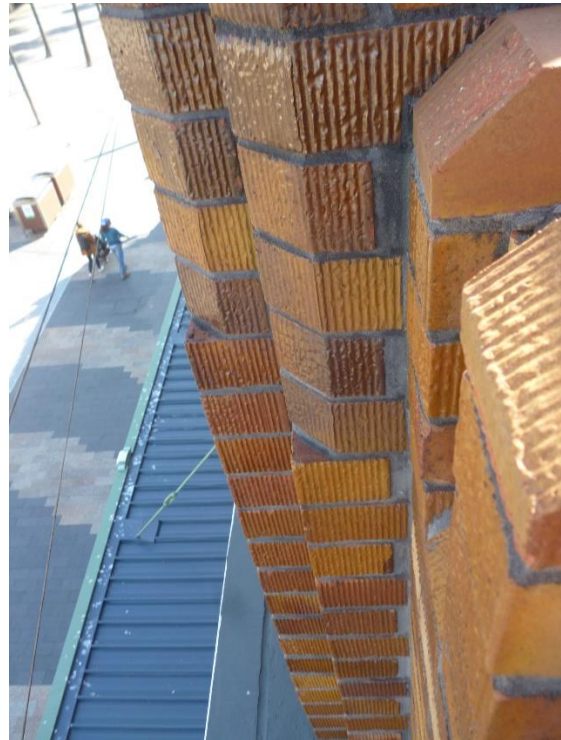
View of the brick detailing on the exterior of the Hotel Steyne.
